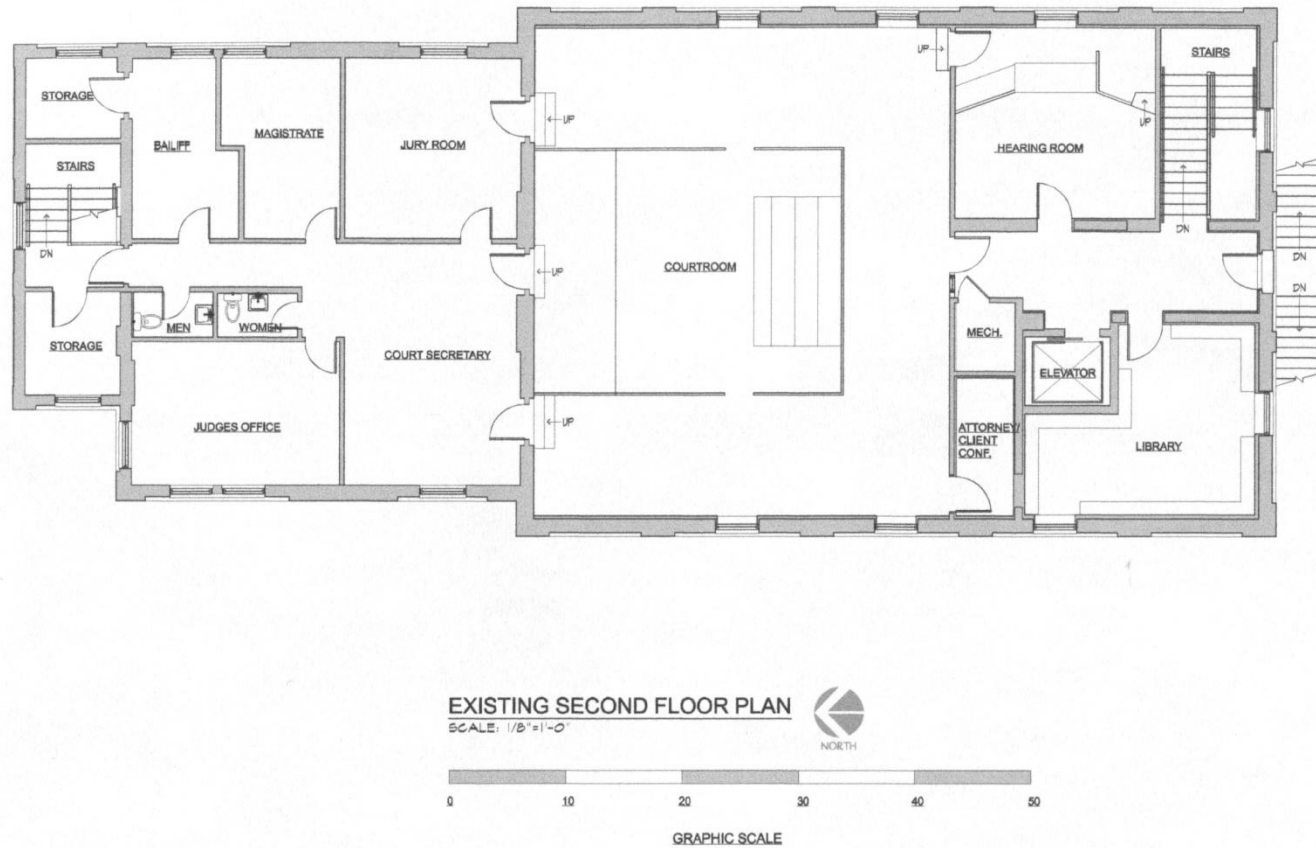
Existing second floor plan, Brown County Courthouse. Source: ADS Brown County Courthouse Study, 2012
